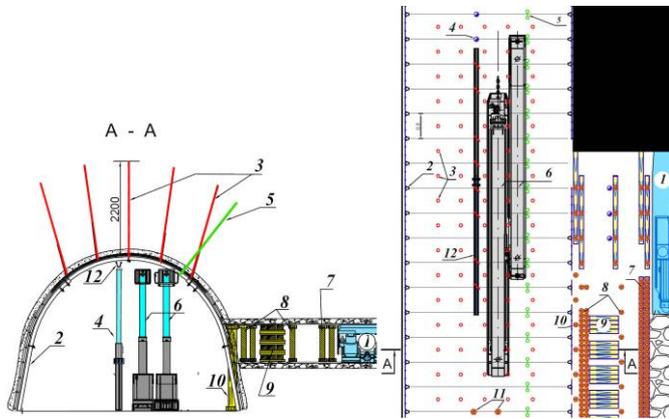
The "classic" support and reinforcement pattern of the gateroad #163 at intersection with #161 longwall: 1 – longwall set of equipment; 2 – steel arch support KShPU-17,7; 3 – rock bolts; 4 – hydraulic props installed 20 m in front of the longwall face and under the horsehead; 5 – rock bolts connected to the top section of arch support; 6 – face-end supports; elements of roadside pack: 7 – breaker row; 8 – breaker props; 9 – chock; 10 – wooden prop between the roof of the seam and the floor of the gateroad; 11 – wooden props installed under each arch; 12 – steel horsehead
